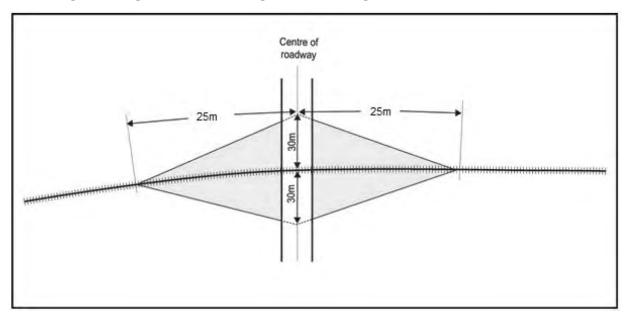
Approach sight triangles for public road/rail siding level crossings.
